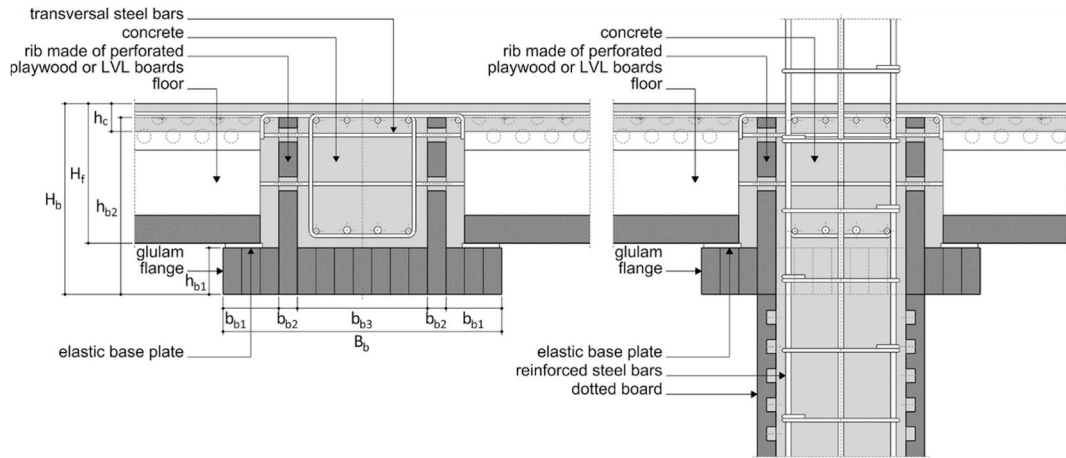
a-Cross-section of the beam with flooring support. b-Beam-to-column connection.
